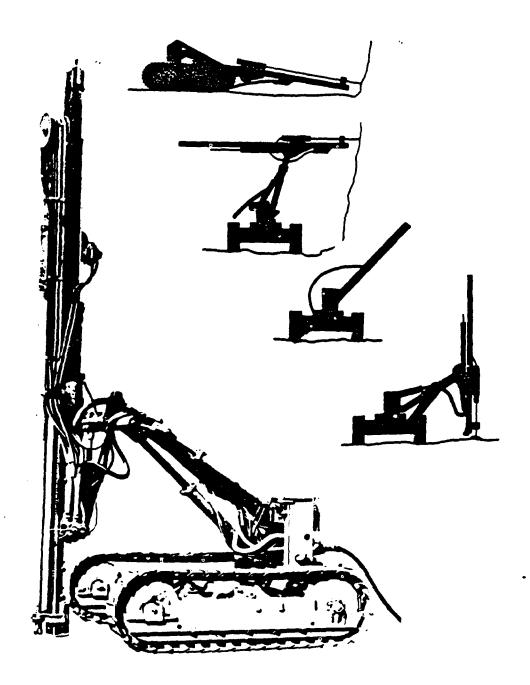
Crawler drill capable of drilling holes from 1-3/4 to 3 in. in diameter. Insets show setup for various hole inclinations 9
